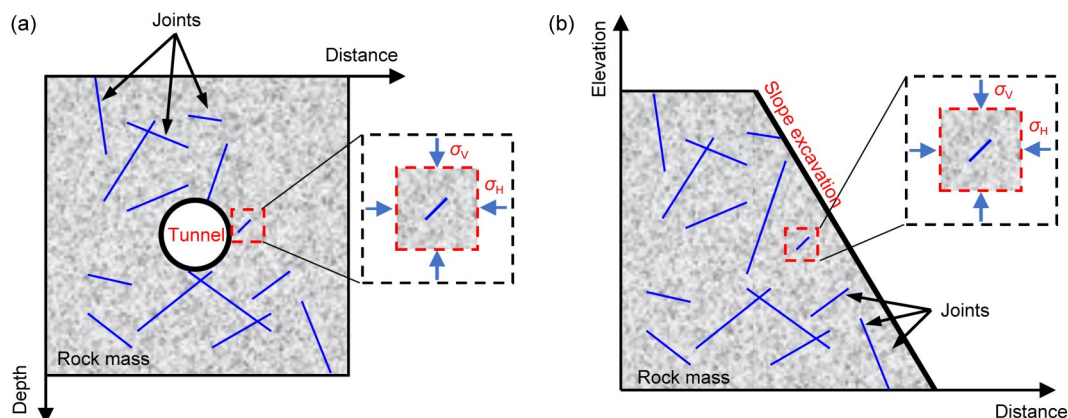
Schematic diagrams showing the underground excavation (e.g., tunnel) (a) and the open excavation (e.g., slope) (b) in the fractured rock mass. σ_v is the vertical stress, and σ_h is the horizontal stress
